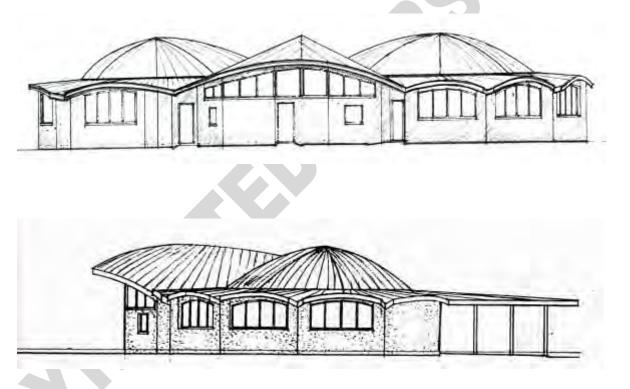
Elevations of the original design with curved petal shaped lower roof sections and Lobby
